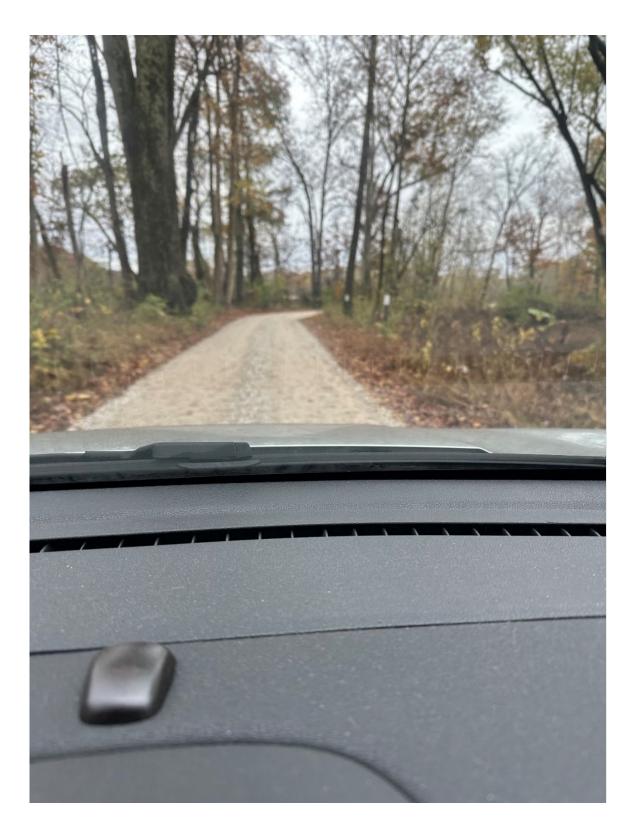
Traveling north along N Maple Grove Road from W Delap Road
